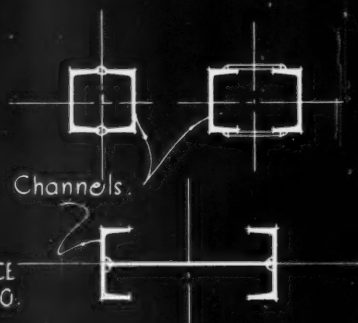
TYPES OF COLUMNS FOR WELDING
